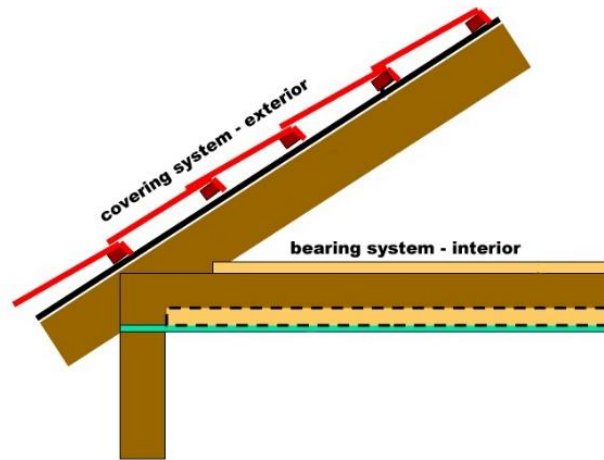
Inside and outside layers on pitched roof [URL 9]
